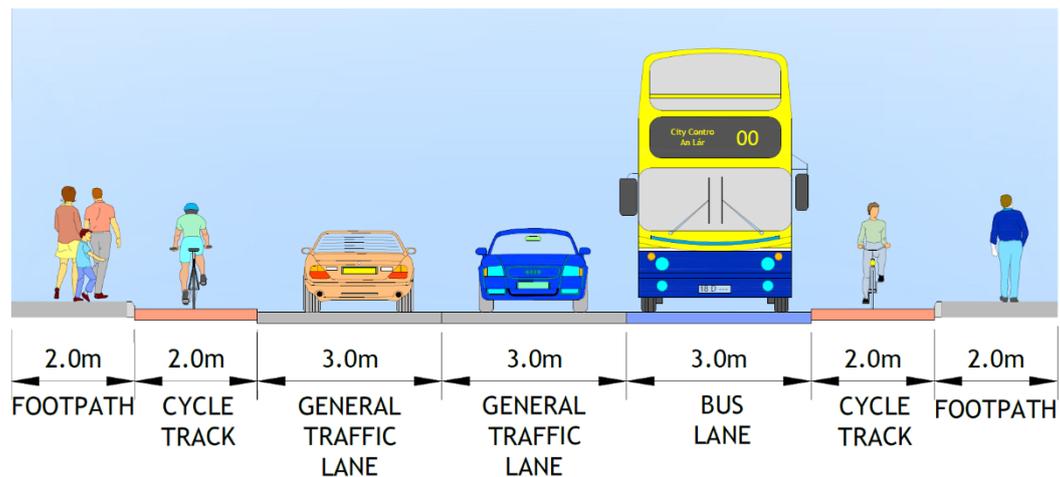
Cross-Section E-E (Relevant to RF5)
